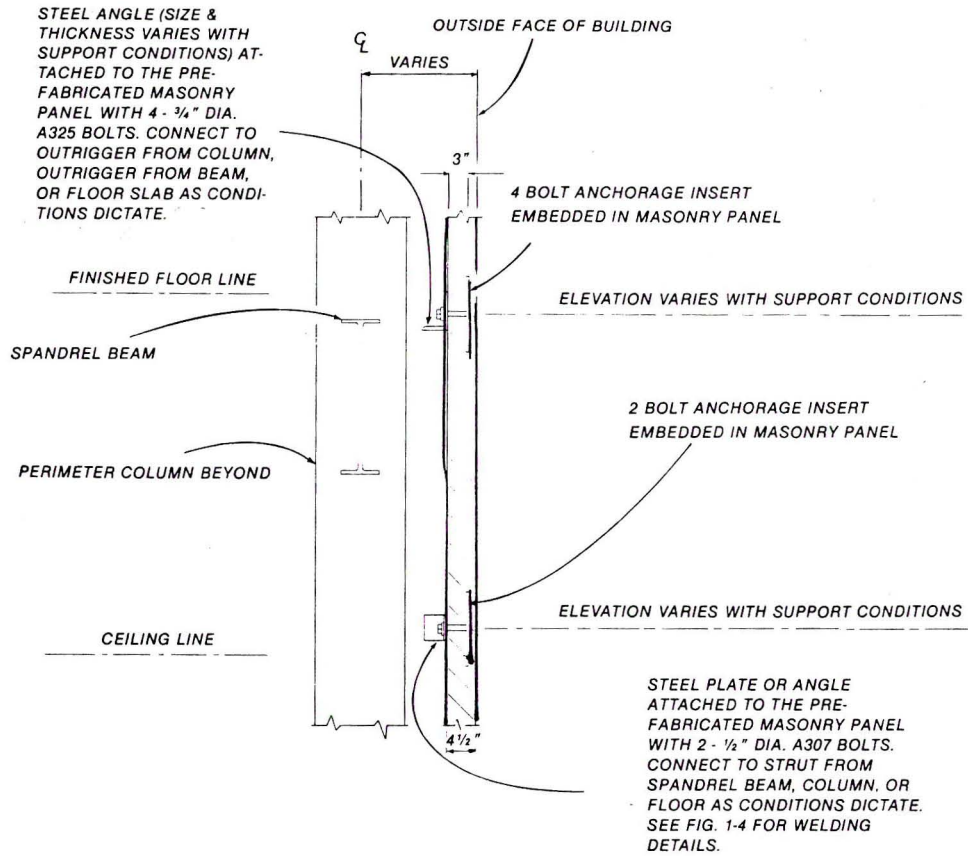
INSIDE ELEVATION - TYPICAL PREFABRICATED MASONRY PANEL
